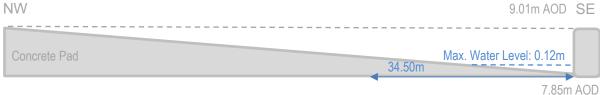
Cross Sectional Profile – Surface Water Storage Measures (Southern Pad)
